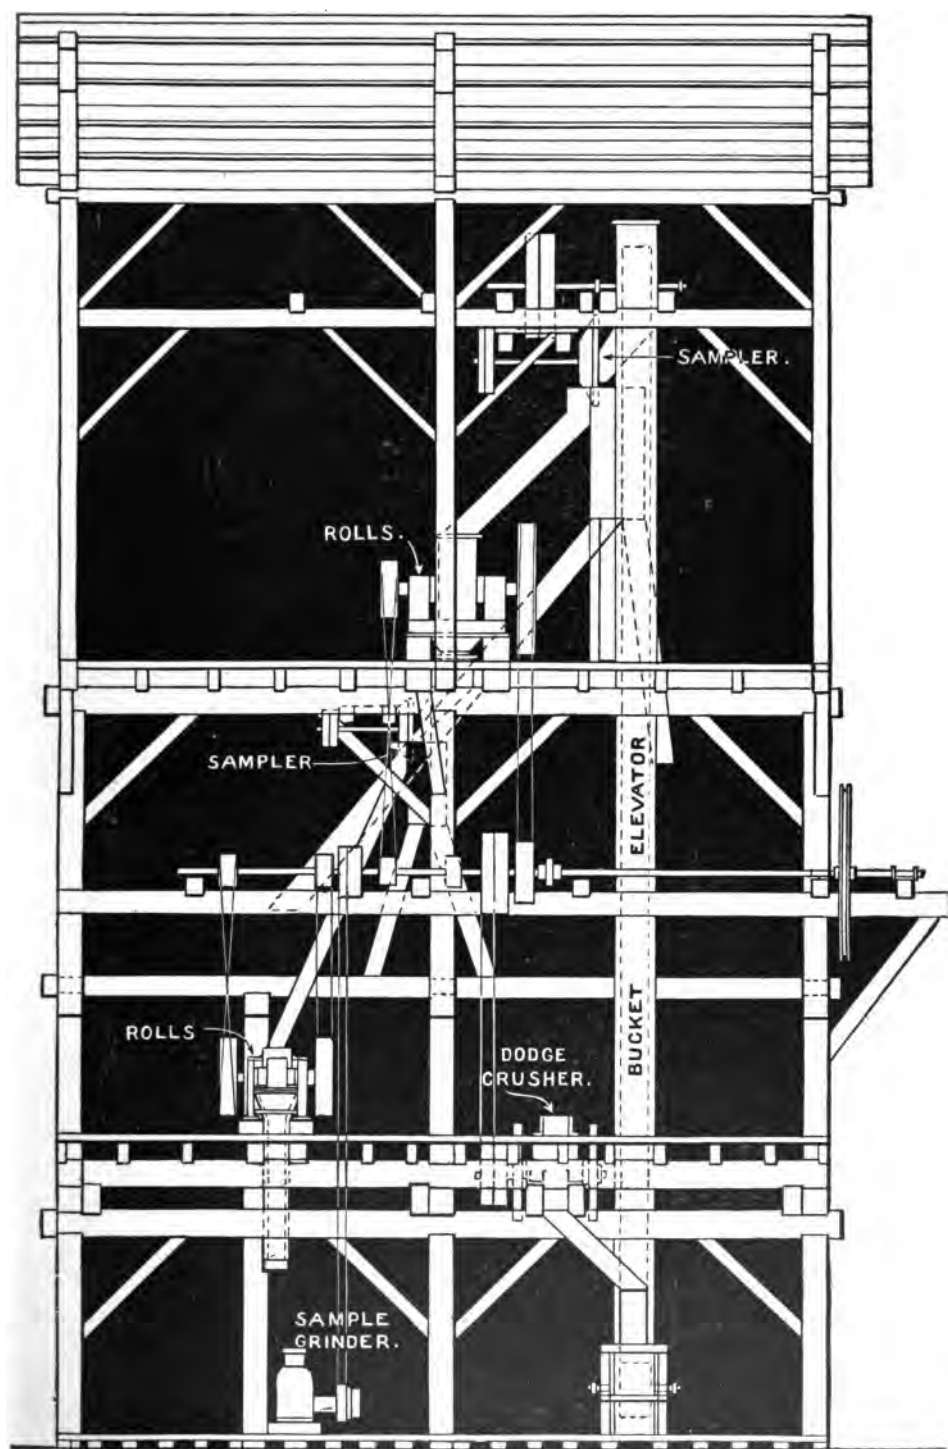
AUTOMATIC SAMPLING PLANT. (FRONT ELEVATION.)
